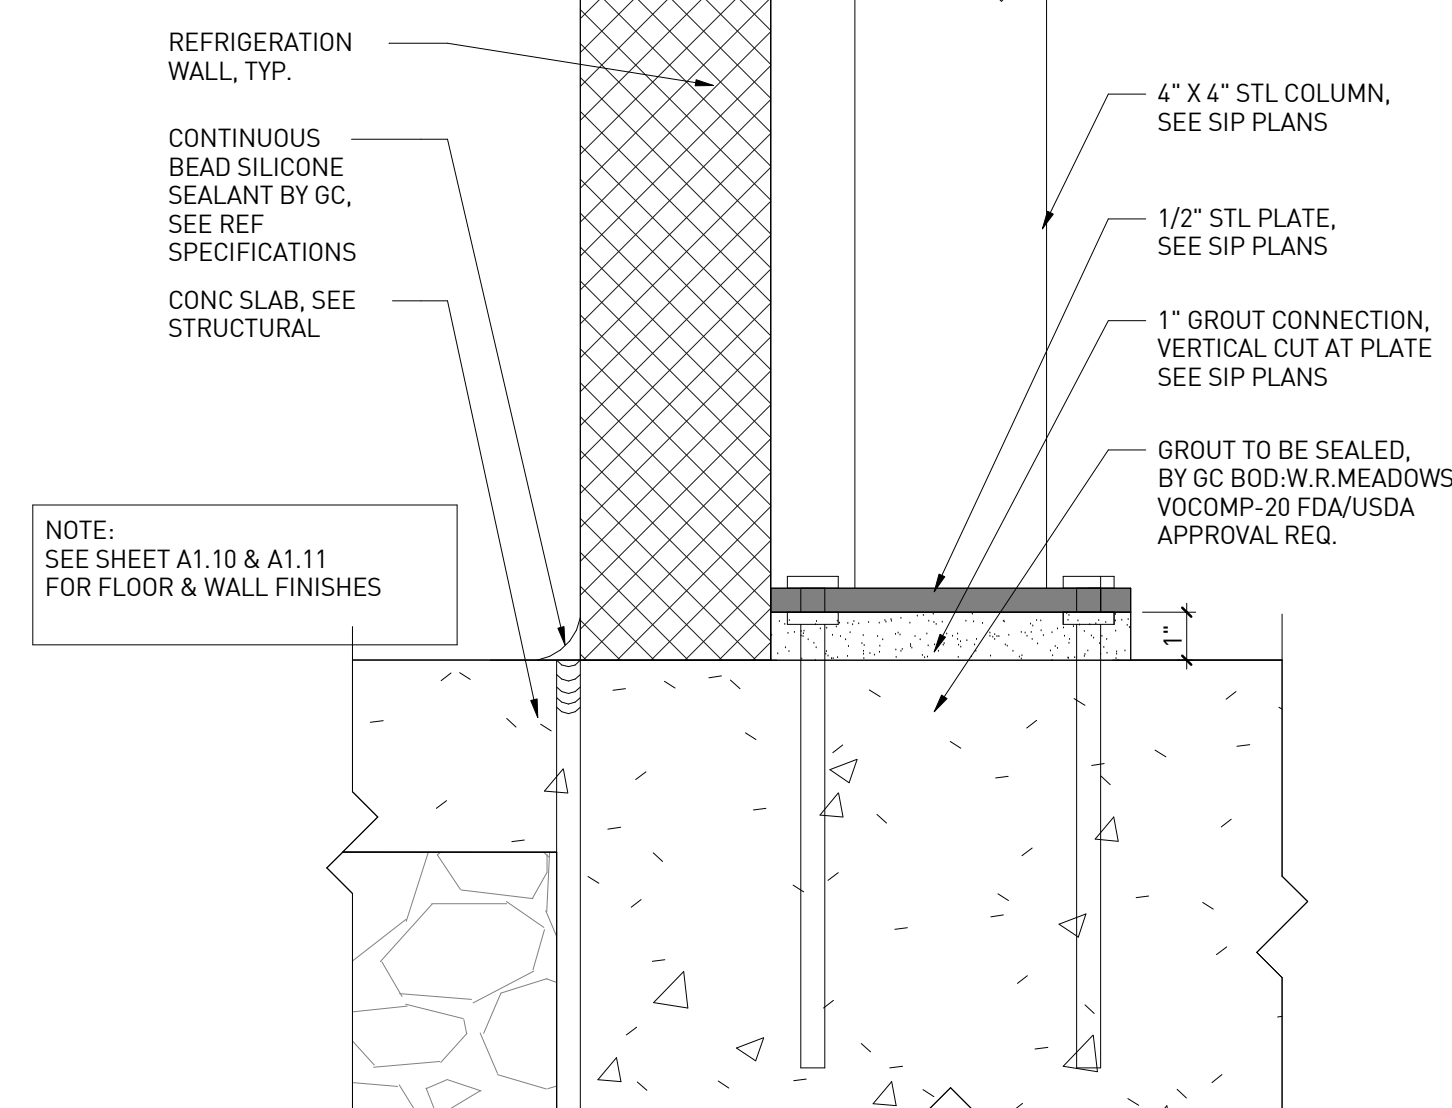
DETAIL AT REFRIGERATION DOOR OPENINGS | 11
